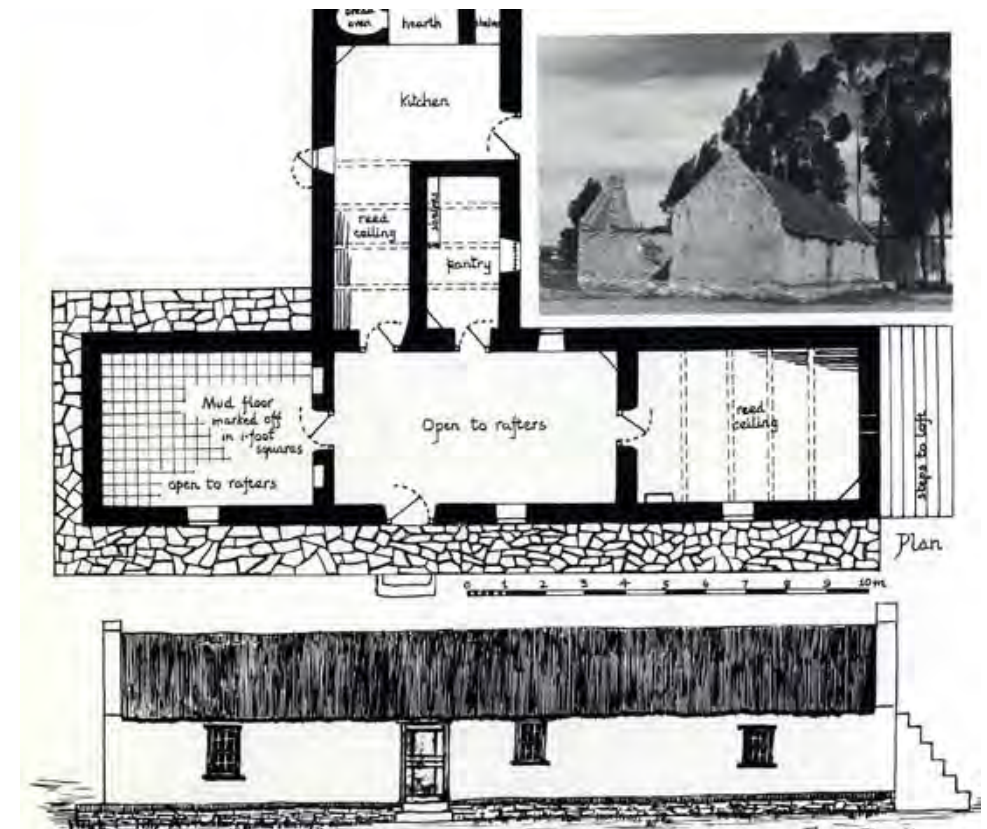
(ABOVE): Note one room deep floor plan of the traditional Cape vernacular building. (VASSA)
